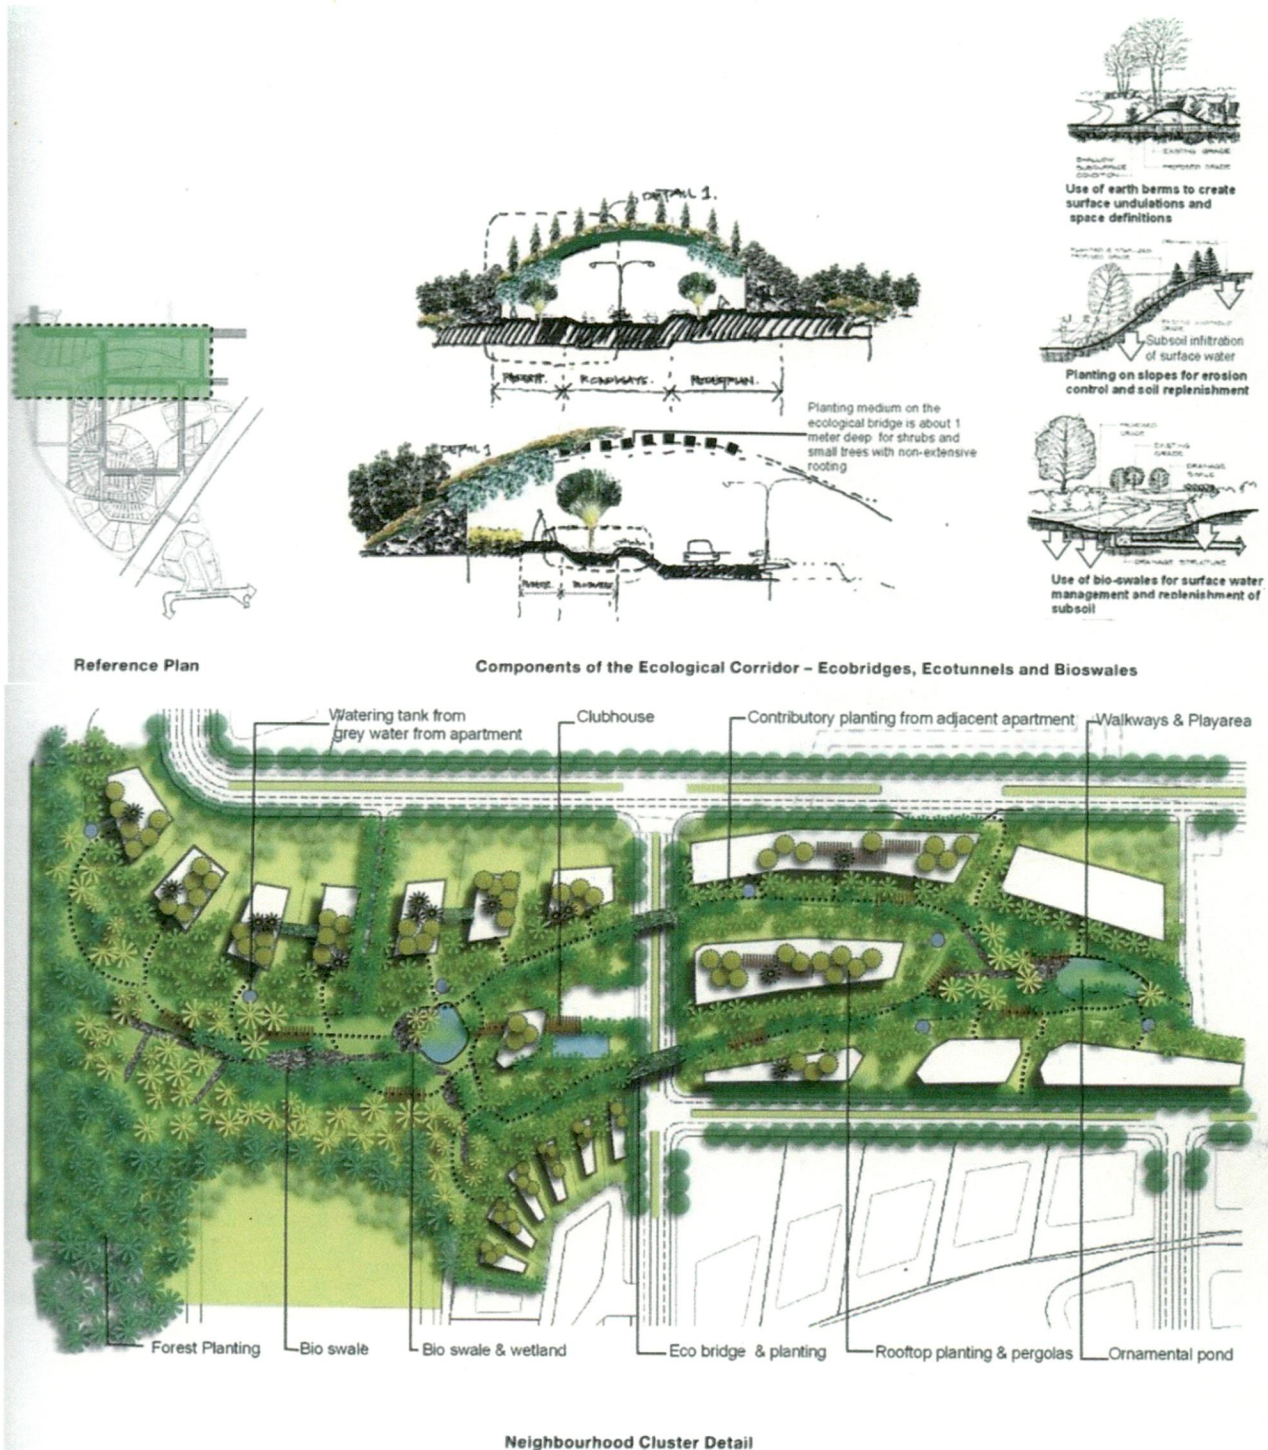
Eco-bridges, Eco-tunnels and Bioswales – Soma Masterplan
